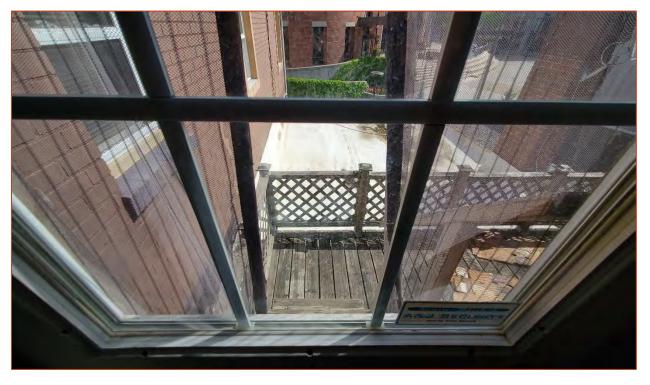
View northeast showing the rear deck on the roof of the rear wing addition on the building on 48 Main Street North
